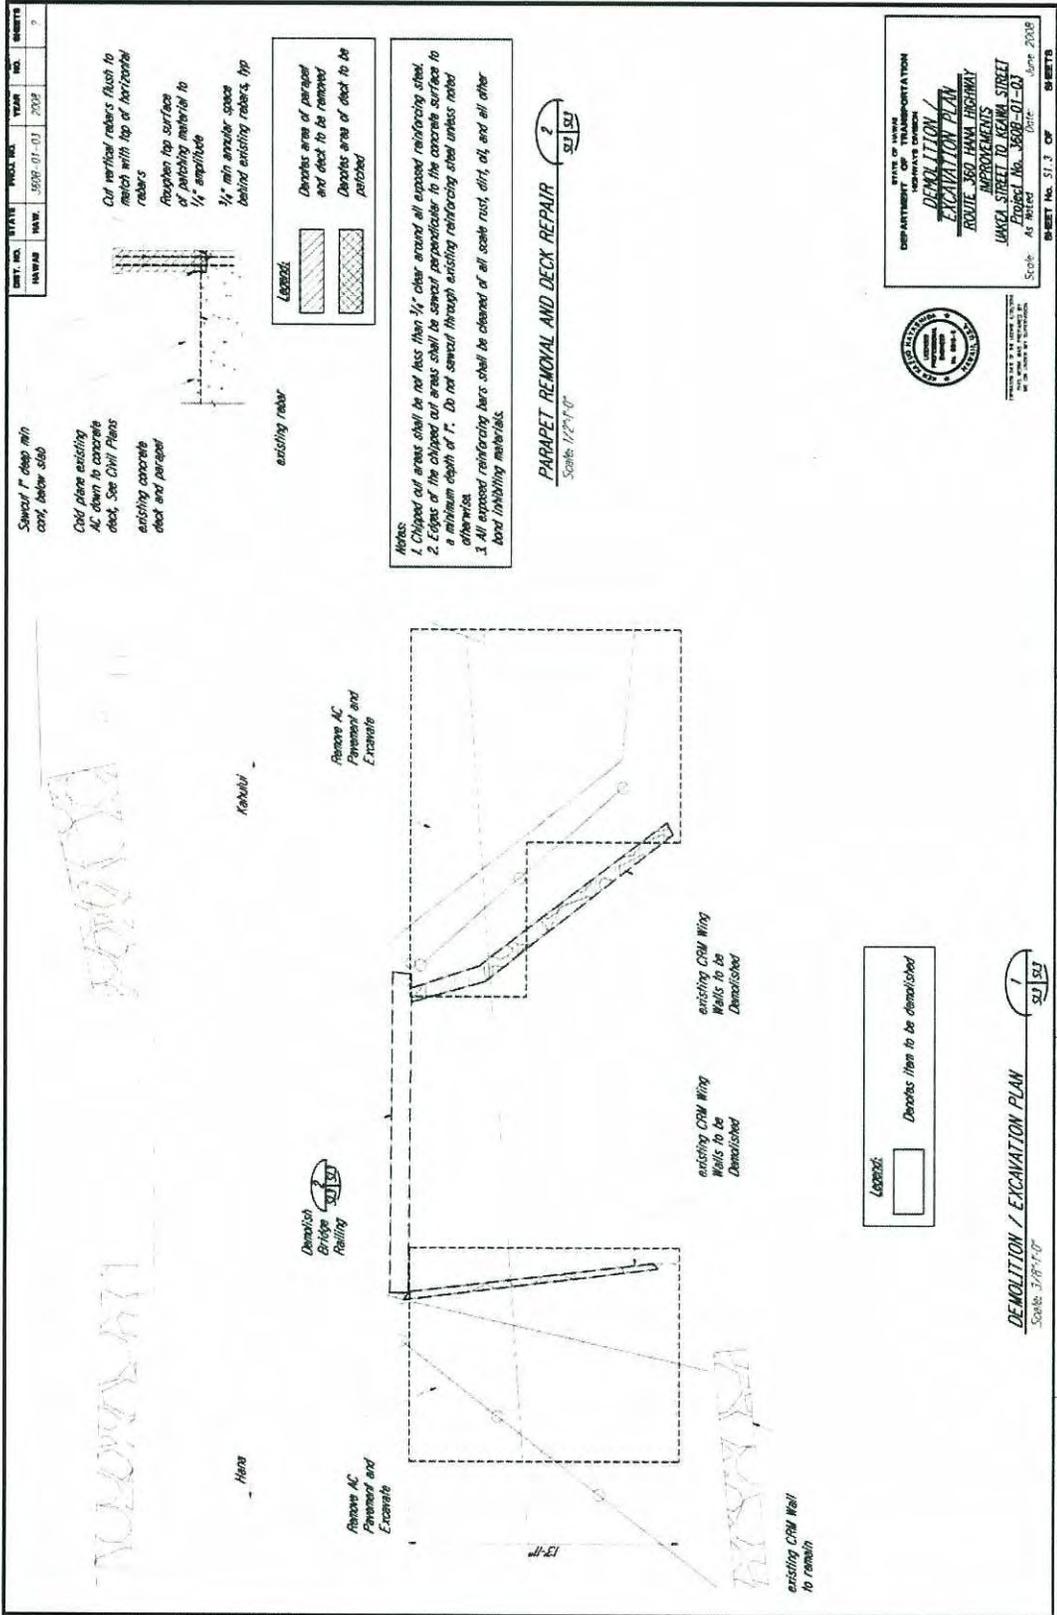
Plan View of Bridge Showing Portion of Basalt and Concrete Culvert to be Demolished (Map Courtesy of AECOM)
